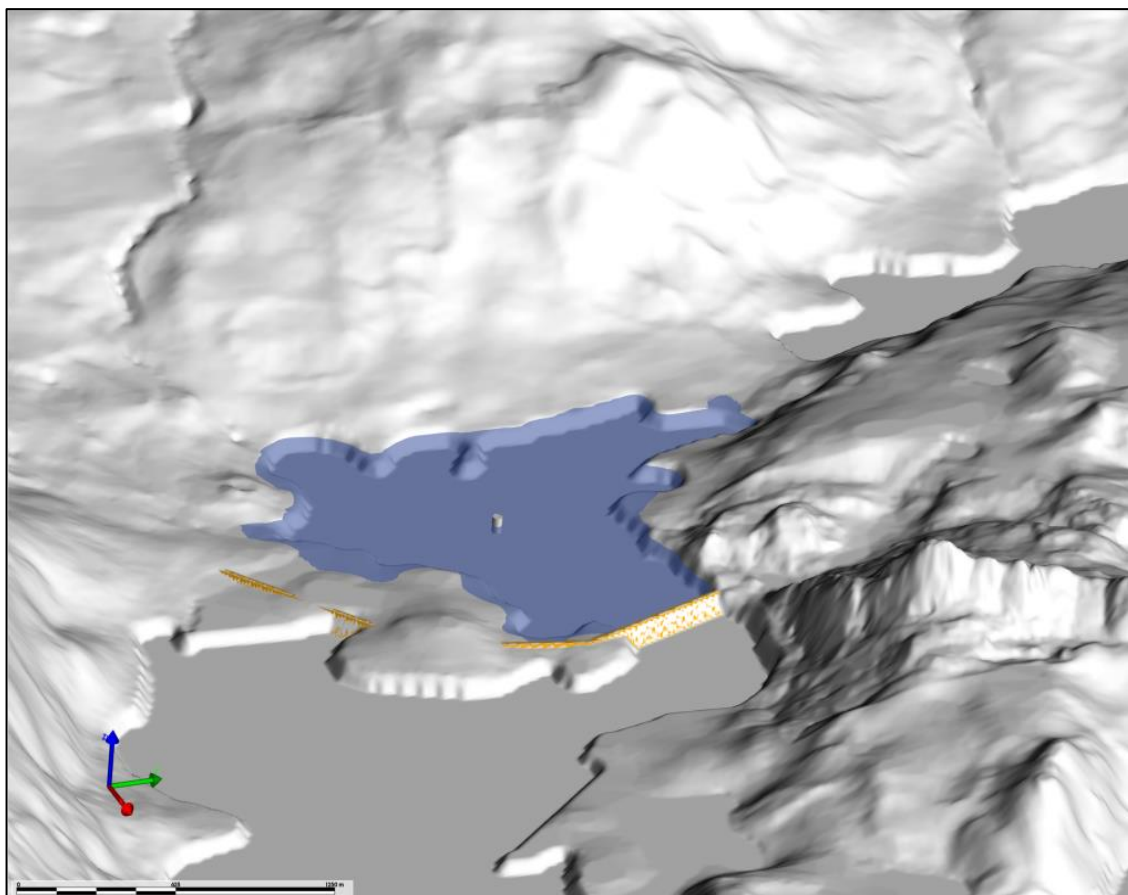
3D view (looking northwest) of starter embankment configuration
